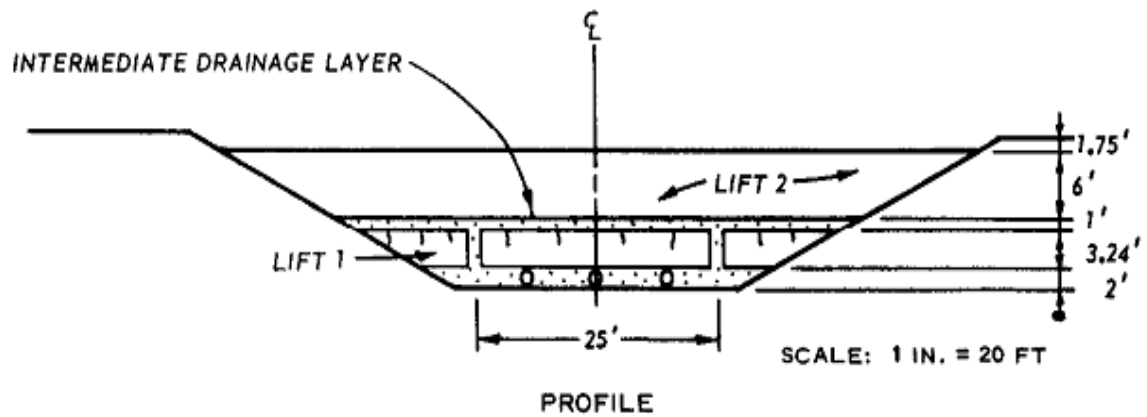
Layout of horizontal drainage used for vacuum test sections (after Hammer 1981)
